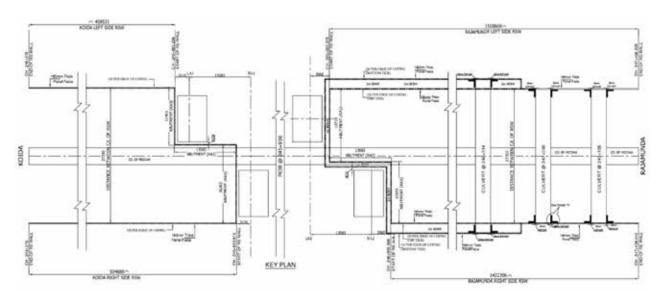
Key plan of ROB at chainage 245+936 of Koida to Rajamunda section
